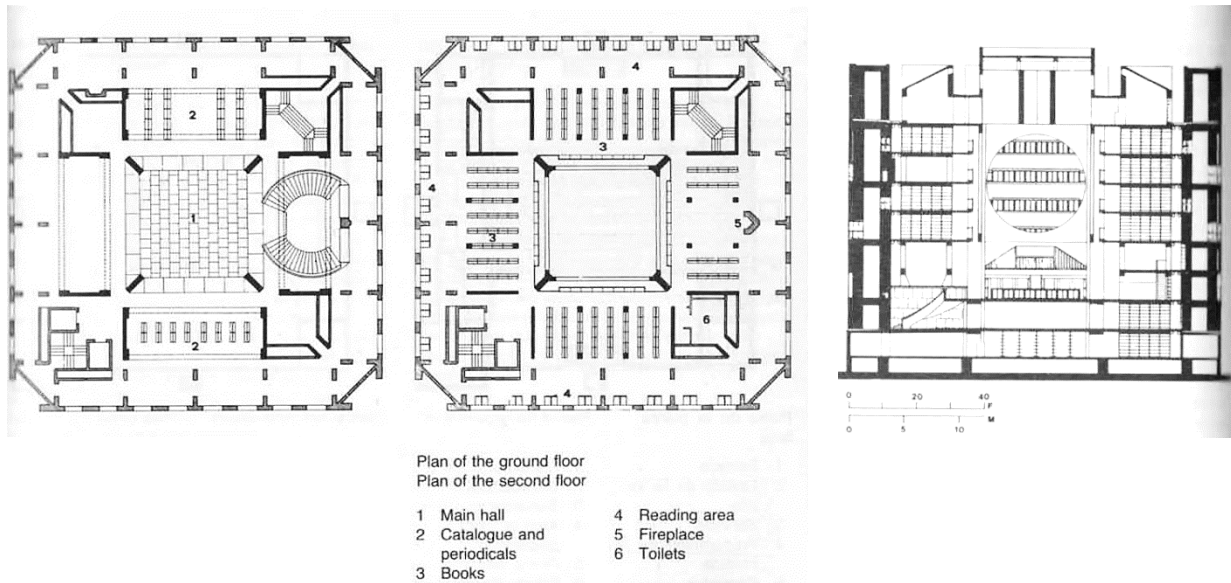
Louis I. Kahn. First floor plan, second floor plan, and section. Library at Phillips Exeter Academy, Exeter, NH, 1967-72.
